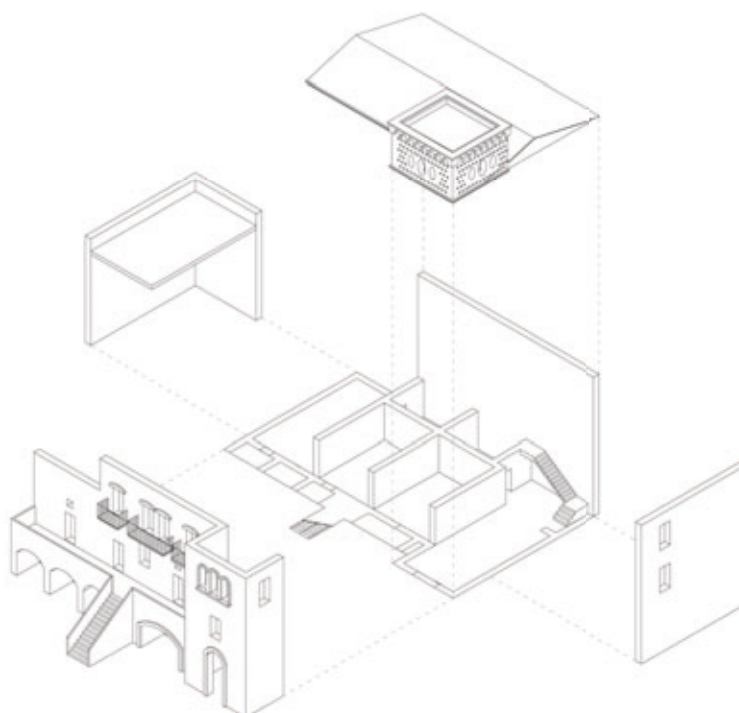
Exploded axonometric view of Raj Tower (Battipaglia)
